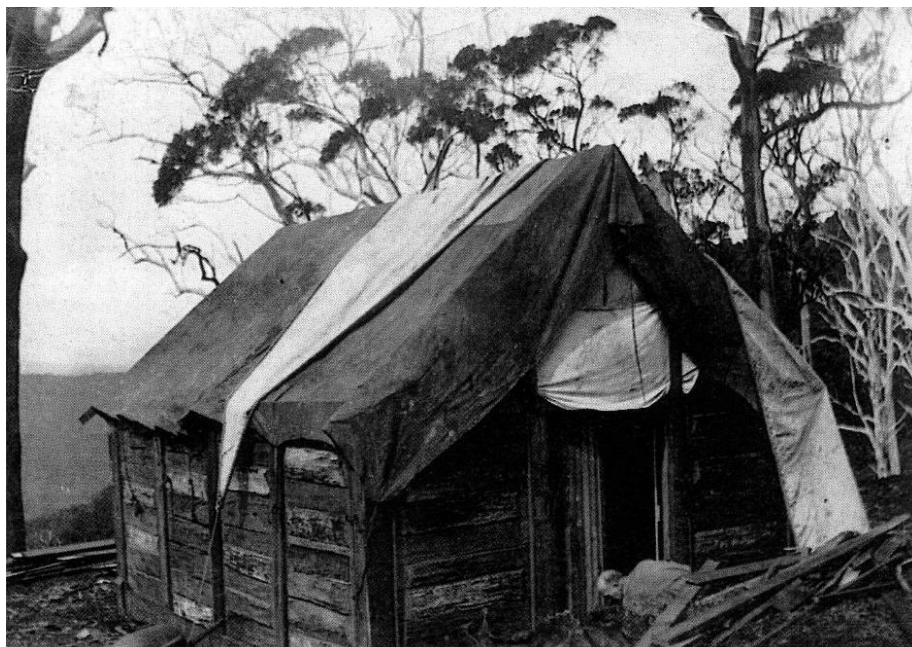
Cabin 5 with its canvas roof prior to the roof being shingled. According to Throssell: “For a long time cabins were used with canvas roofs, because roof shingles had to be dried out for a couple of months.” (Throssell, 68)
